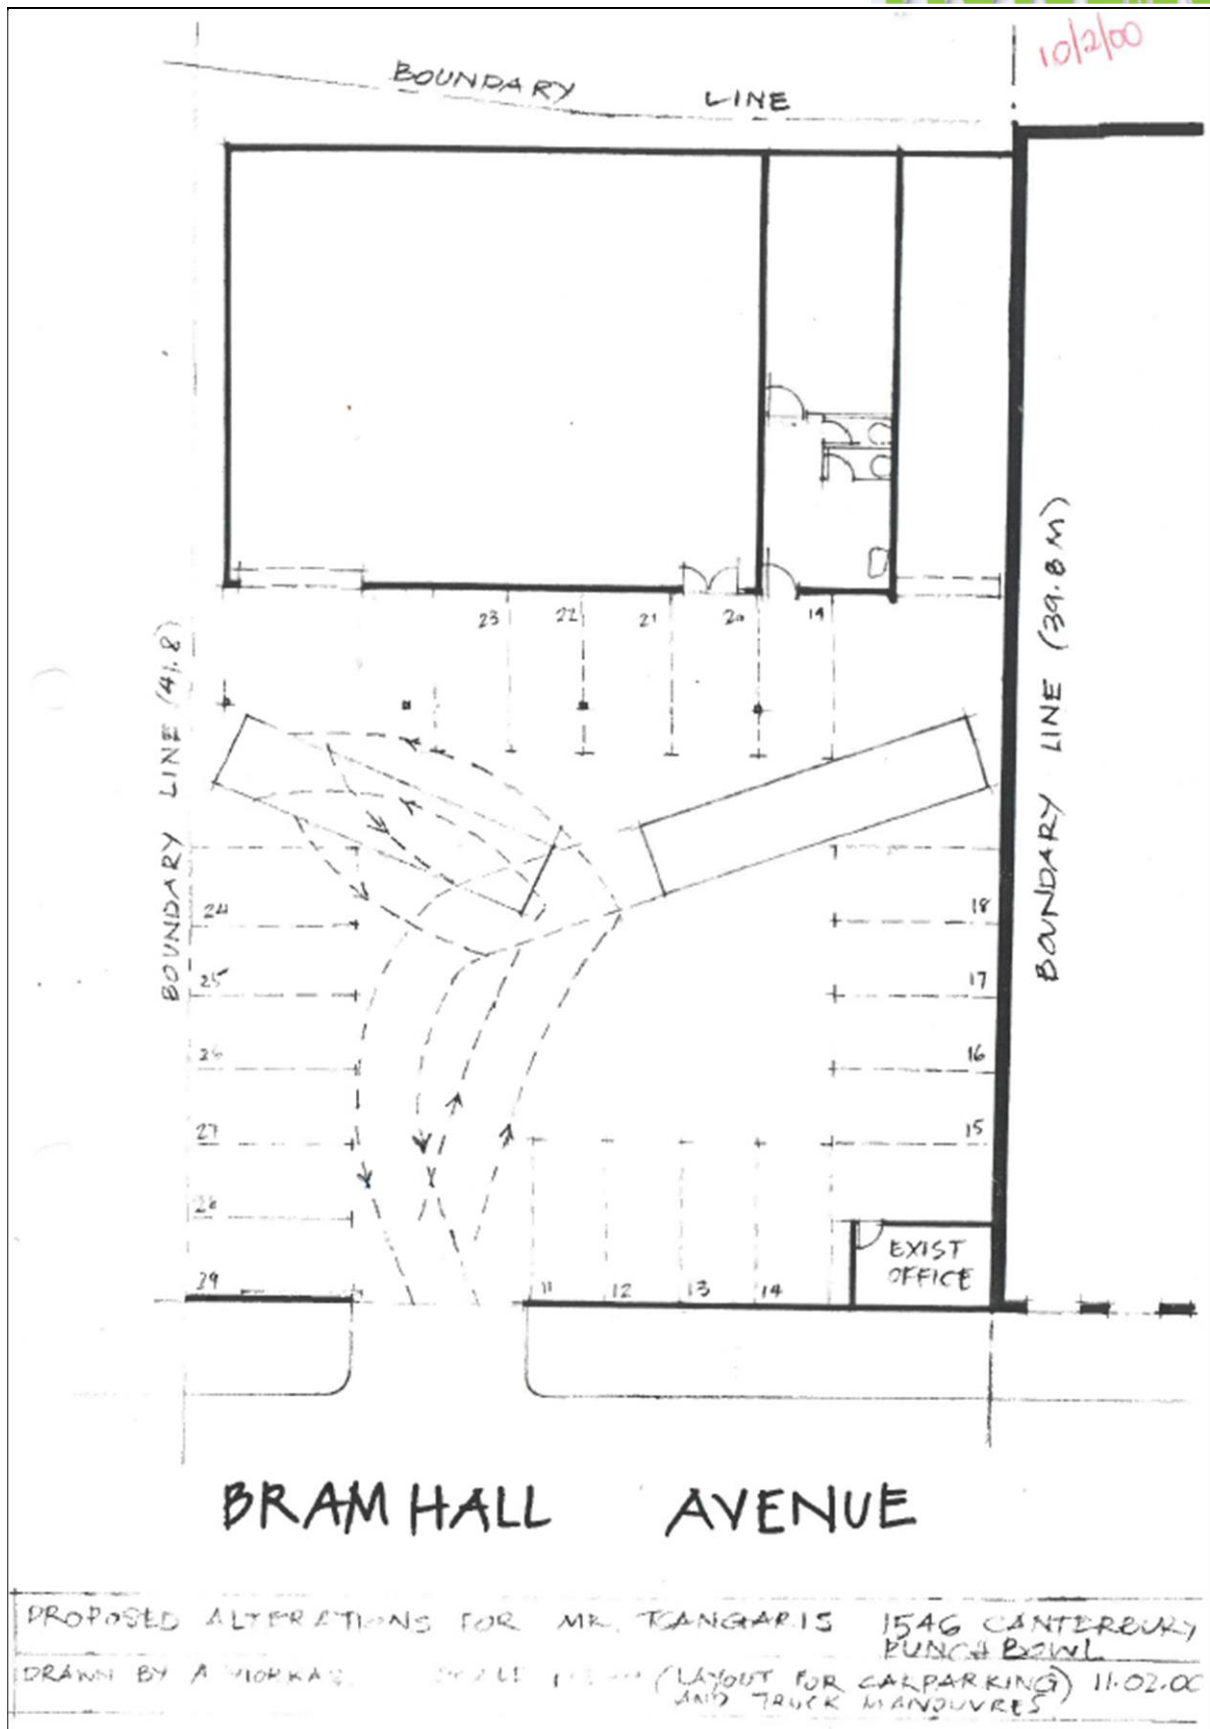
DA792-99 Plan showing 3 reduced parking space (rear parking) Source: Council
